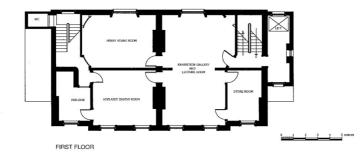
The Decimus Burton Museum – proposed first floor plan. Copyright Paul Avis
